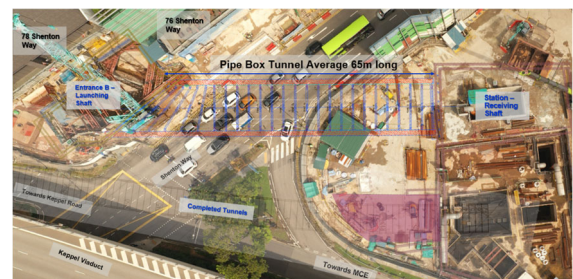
Pipe Box Tunnel Layout Plan at Shenton Way
